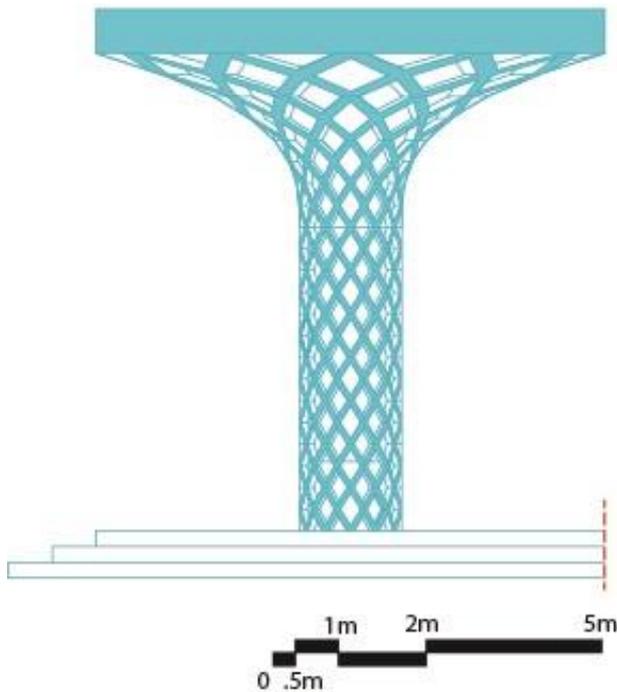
Frontal elevation of a Pavilion Collector DFC.
